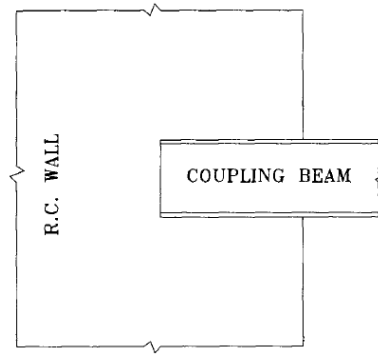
Example of a Coupling Seated in the Plane of a Concrete (Shahrooz, Remmetter et al. 1993)
